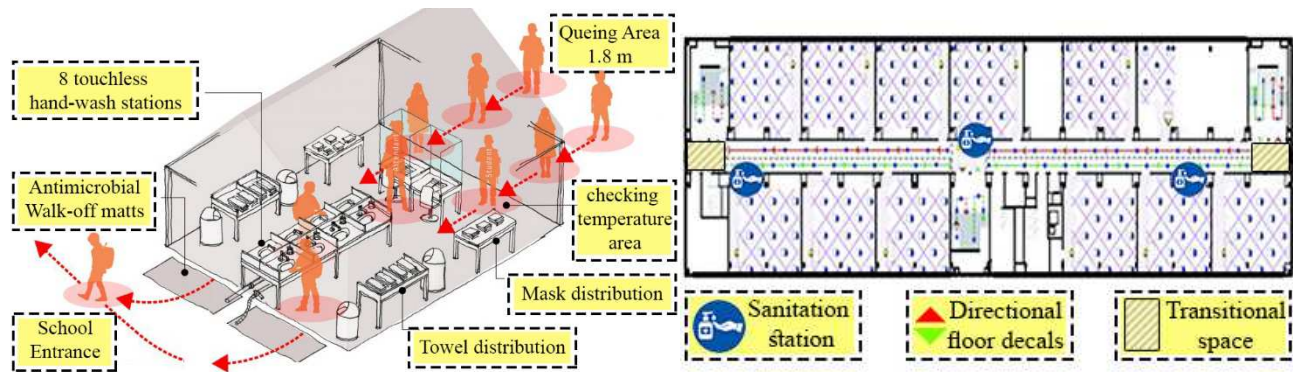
(left) : Prefabricated handwashing stations before each entrance of the school, upgraded from (Dubey, 2020). Fig. 11 (right) :Social distancing in classrooms and paths, upgraded from (Dubey, 2020).
